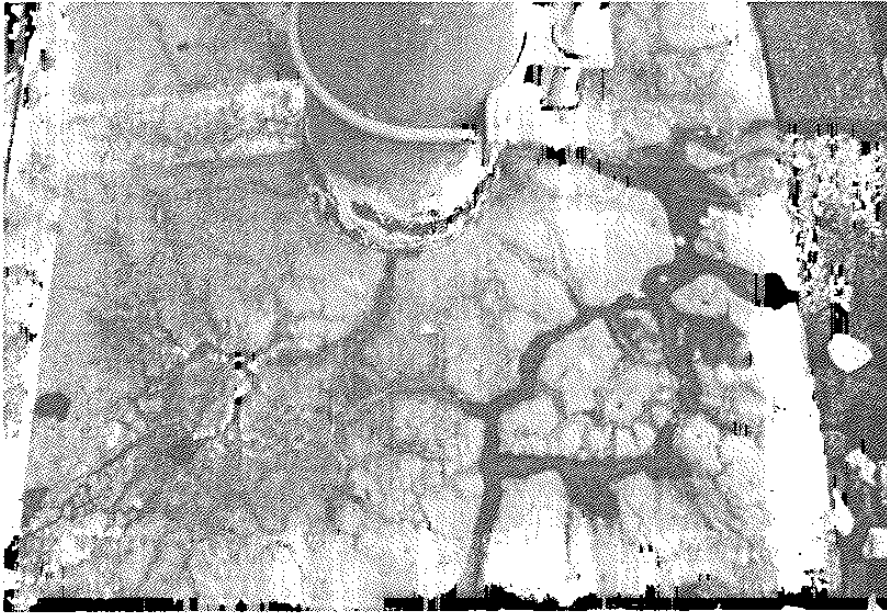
Cracking in cast-in-situ concrete pedestal for electric power line.
